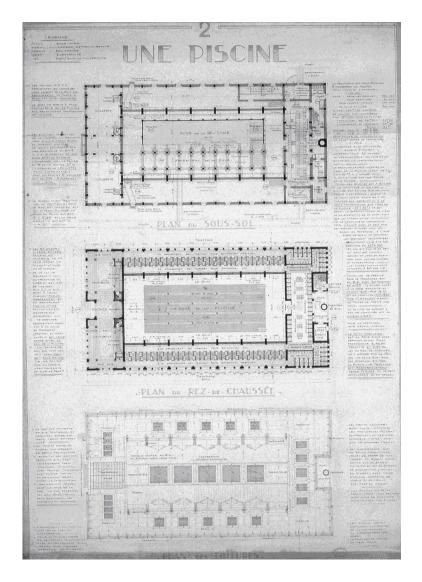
Eschbaecher, "concours de construction générale" 1930: a swimming pool in a youth sports center. Plans (BENSBA, CG 374)
